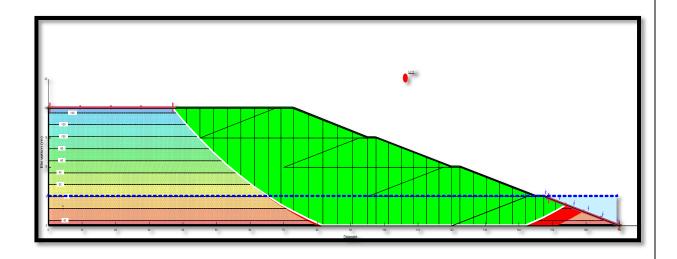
Embankment cross section for 1:4.5 slope at 5 m water level
